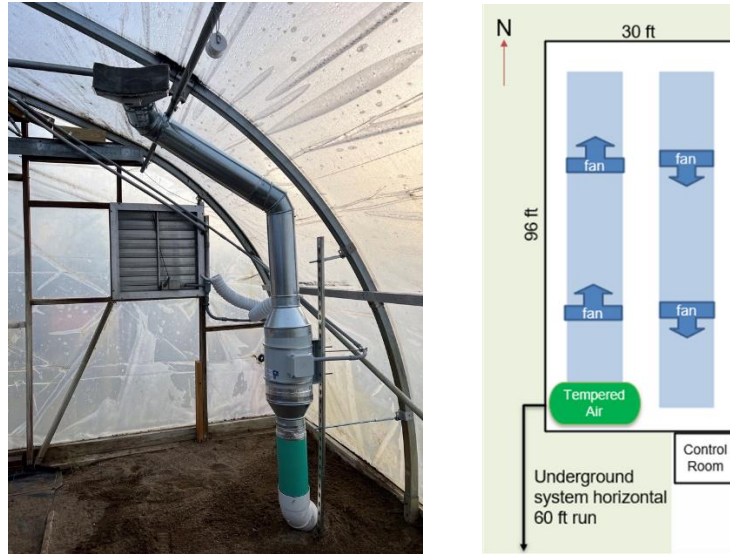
L: Fan and ductwork of EAHX System. R: Plan view of high tunnel and EAHX distribution point
